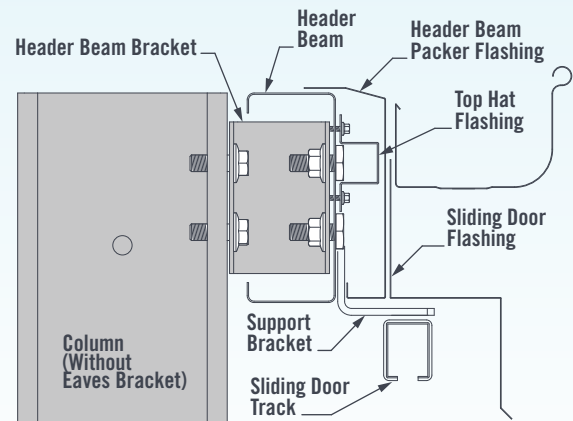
TYPE 4 SINGLE SLIDING DOOR
